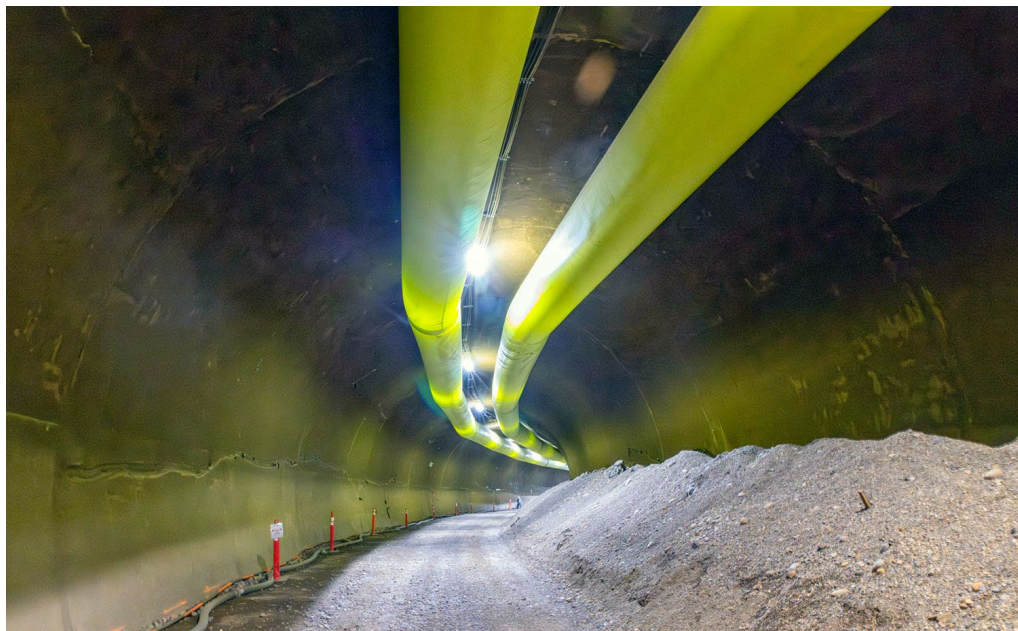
Left Bank Drainage Adit - Production bolting, mesh and shotcrete placement (November 2025)
